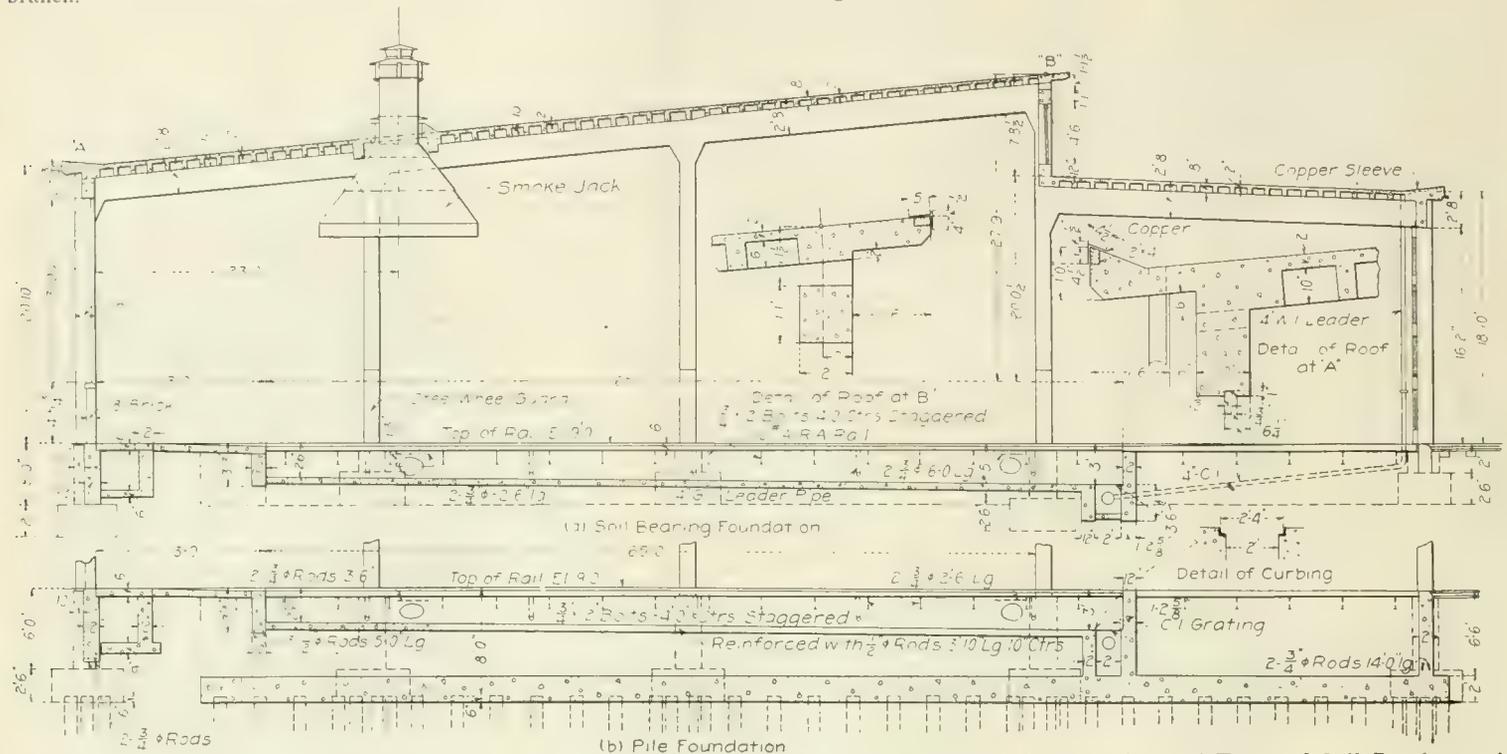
Cross-Section of 100-ft. Roundhouse of Locomotive Terminal Showing Details of Construction and Types of Soil Bearing and Pile Foundations.
